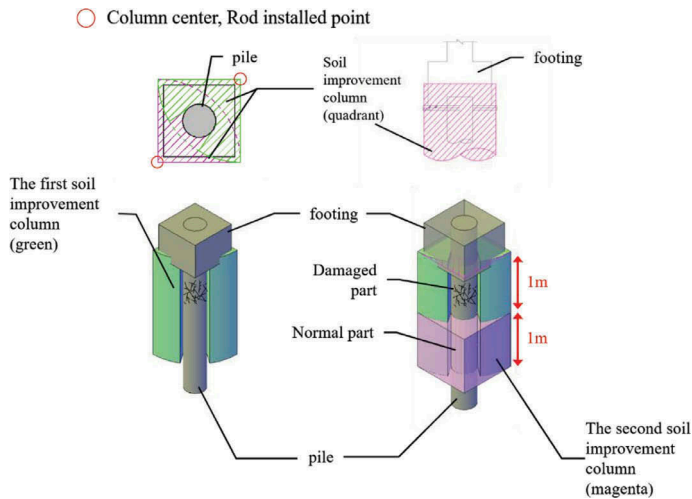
3D illustration of repair and reinforcement for damaged pile foundation using jet grouting
